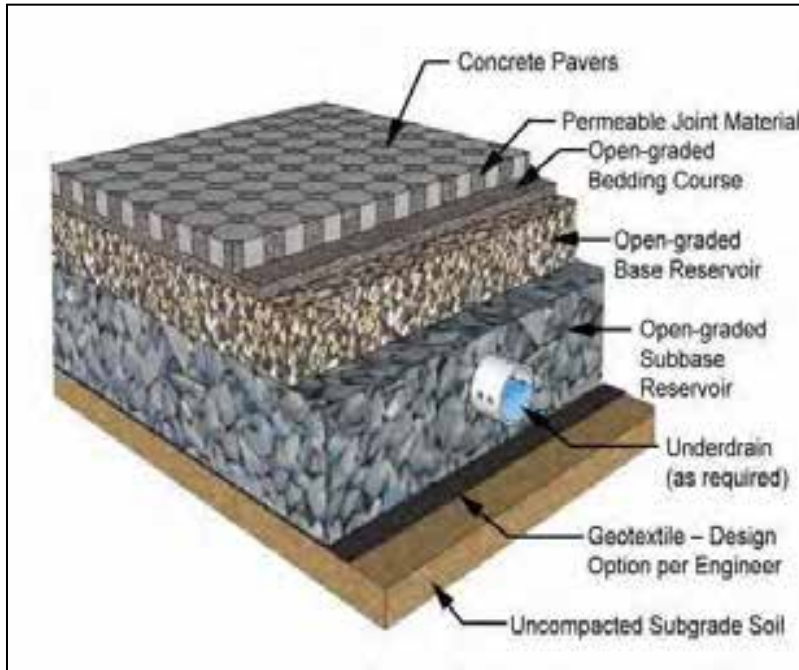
Schematic Profile for Typical Permeable Pavement Section (Source: David Smith, ICPI).
